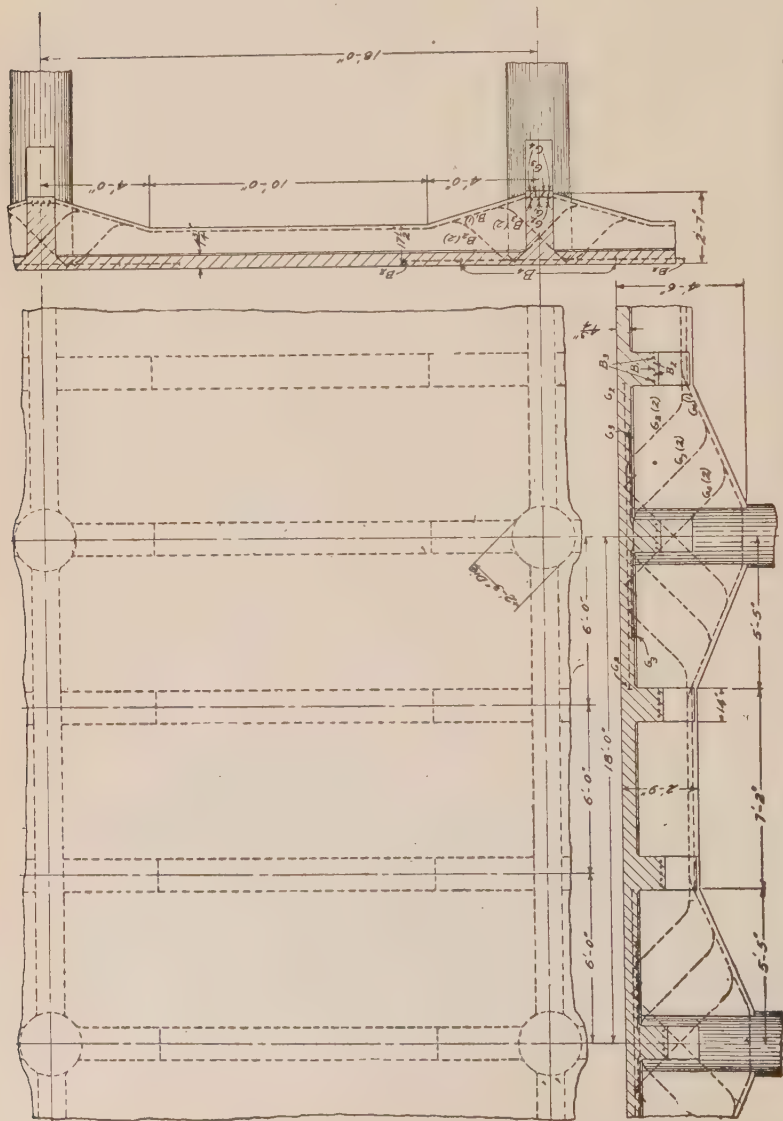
APPROXIMATE DESIGN FOR REINFORCED CONCRETE BEAM AND SLAB CONSTRUCTION TO CARRY LOAD OF 500 LBS. PER SQ. FT. IN ADDITION TO DEAD LOAD.
